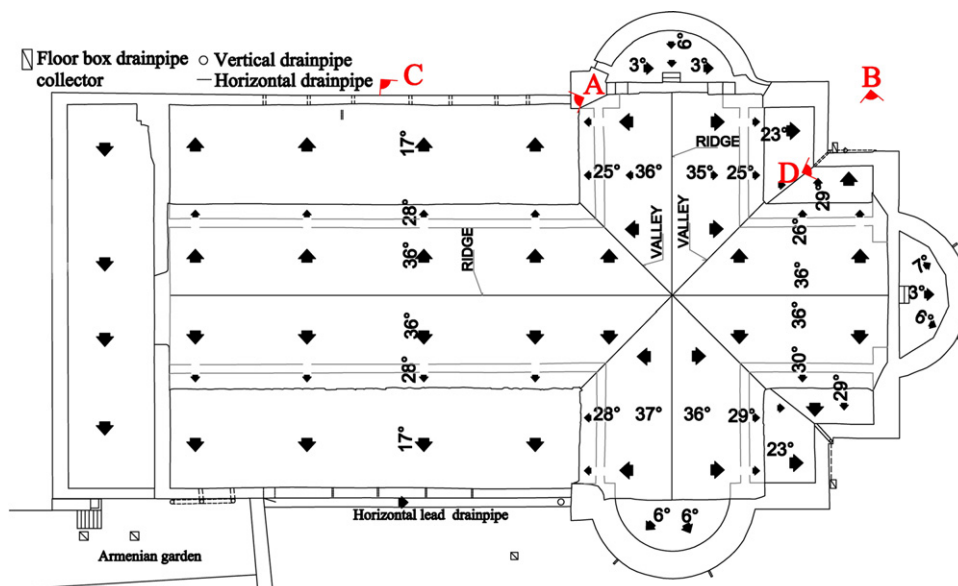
Roof slopes, drainpipes and photo viewpoints.
